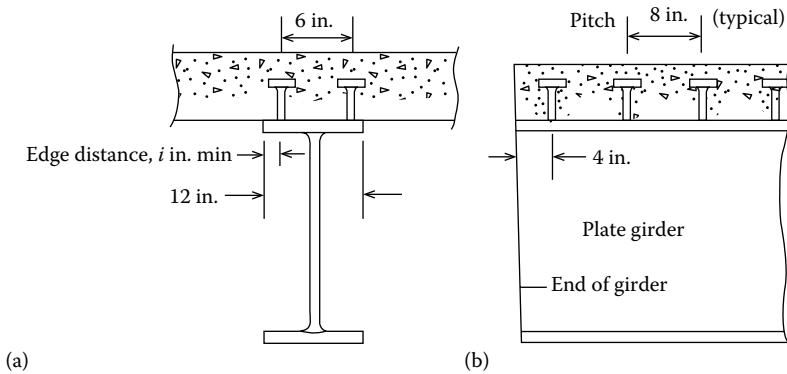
Layout of 3.4 in. × 4 in. long headed shear studs for Example 6.1. (a) Cross section of the composite girder and (b) longitudinal view of the girder with shear studs, $p = 8$ in. (not to scale).
